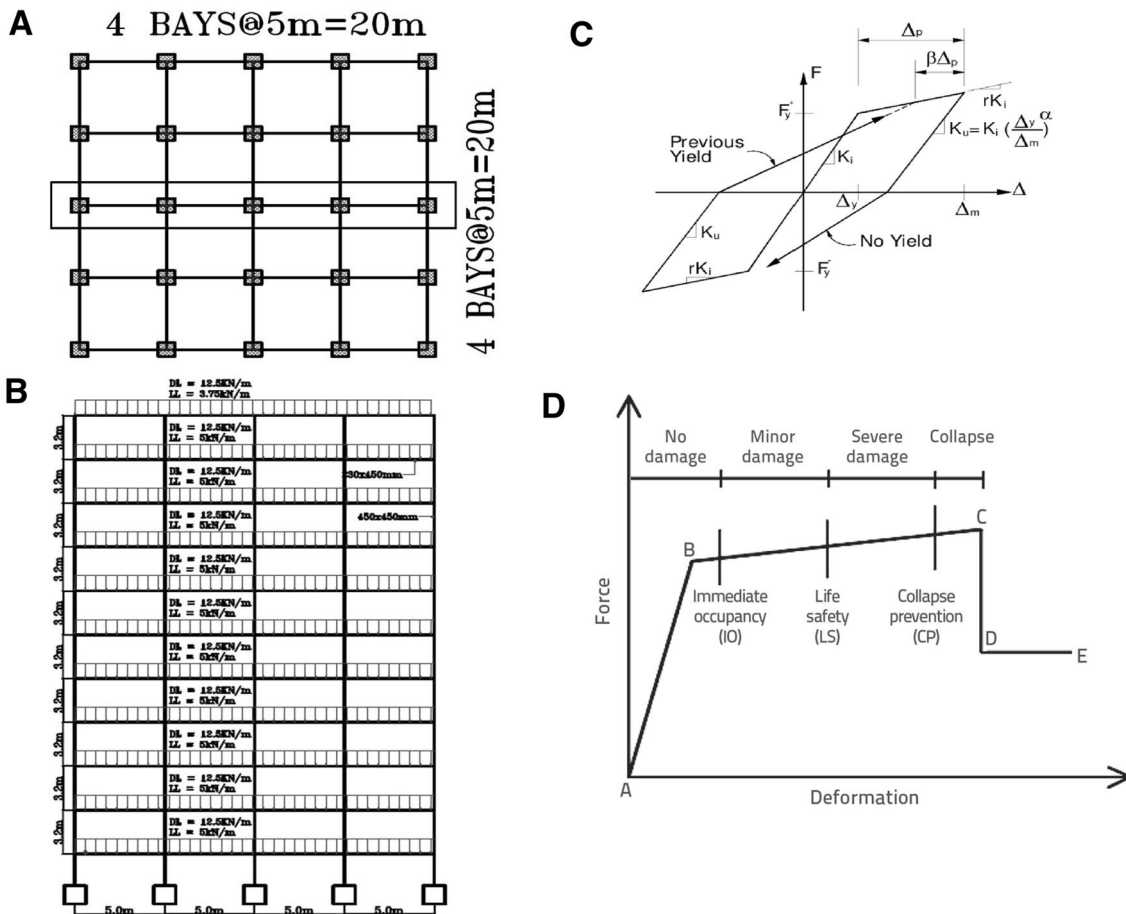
A Plan view of the building, B elevation detail of 11-storey RC regular frame. C Takeda hysteresis model (Takeda et al., 1970). D Force–deformation relationship of a typical plastic hinge (structural performance levels) (Erdem, 2016)
